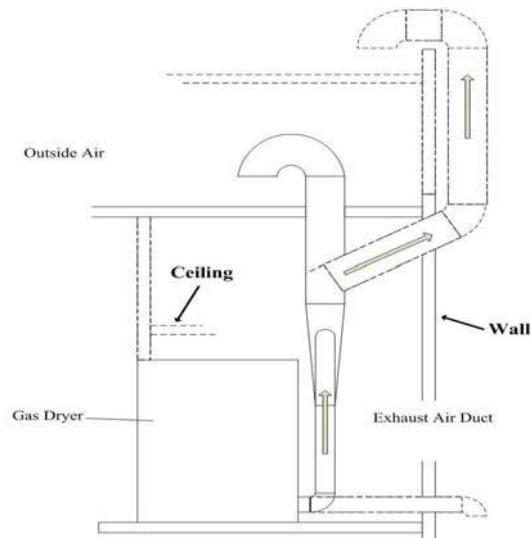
Typical Sectional View on Exhaust Duct Arrangement for Gas Dryer
